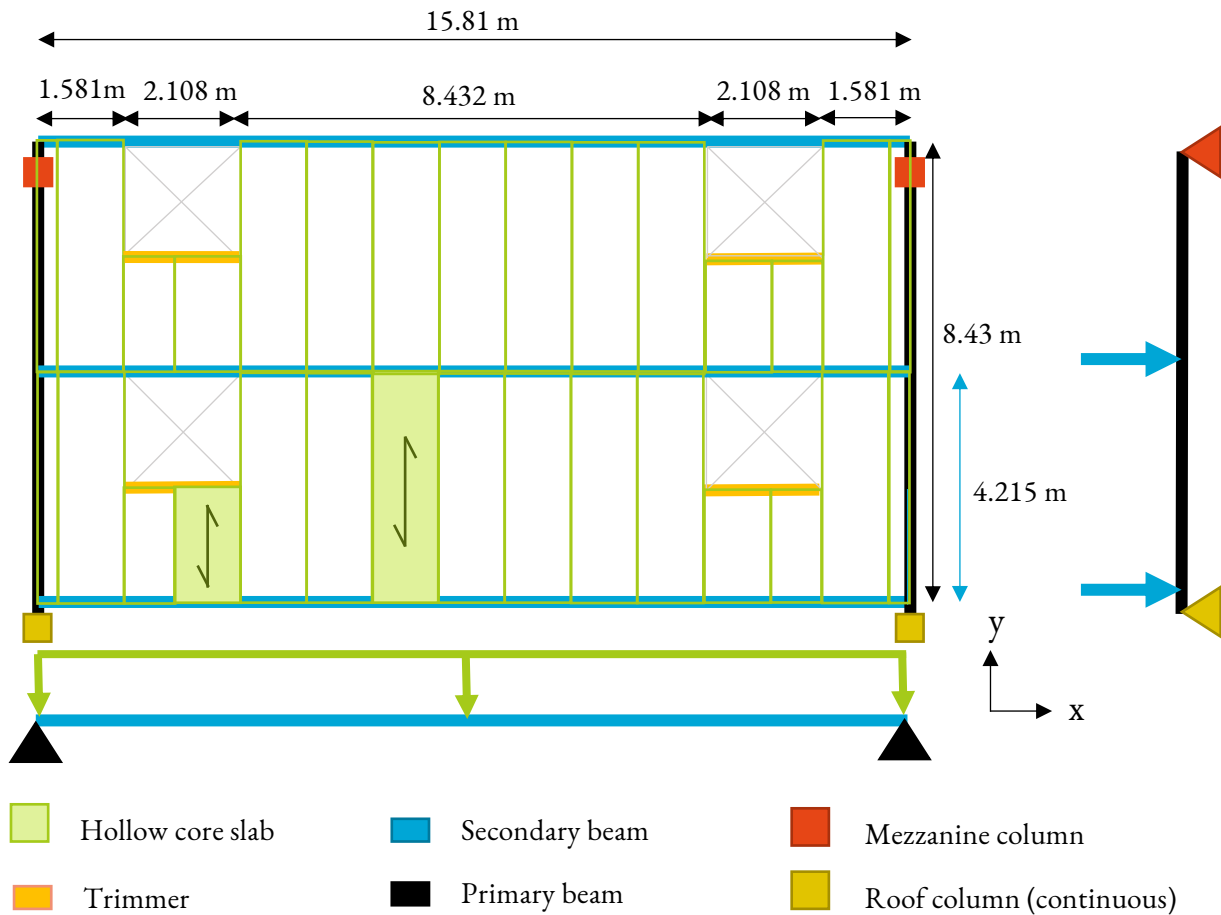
Chosen mezzanine floor layout for Alternative C
